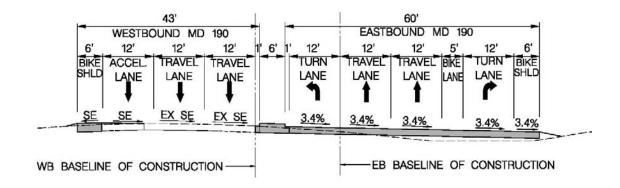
Alternative 3 - MD 190 Intersection West of Pyle Road
